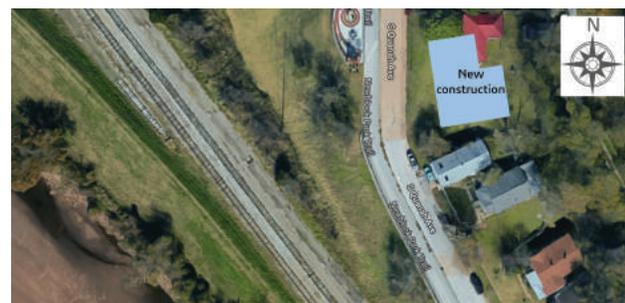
The triplex will be oriented as shown in the above site plan with the west edge (the front of the house) overlooking the Arkansas River.
